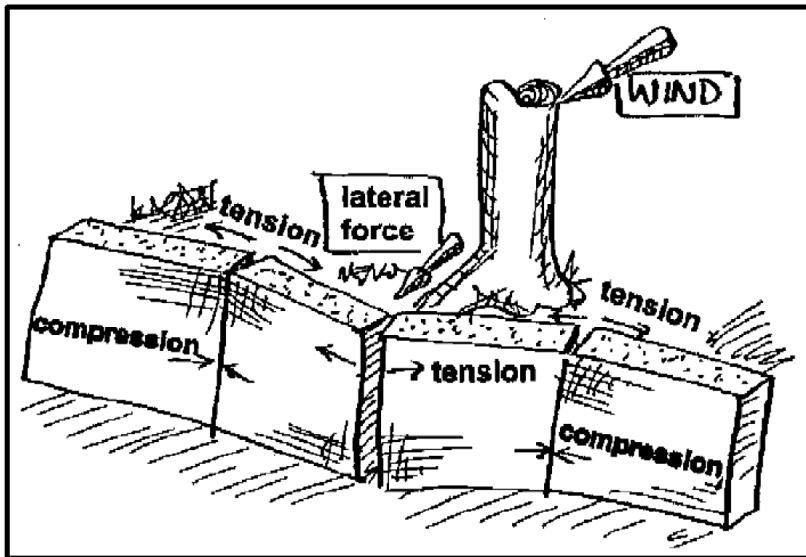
Showing the potential mechanism for damage to the swimming pool wall from Figure 10: Vertical crack caused by a root pressing against the wall. Mattheck et al (2003), P.759
